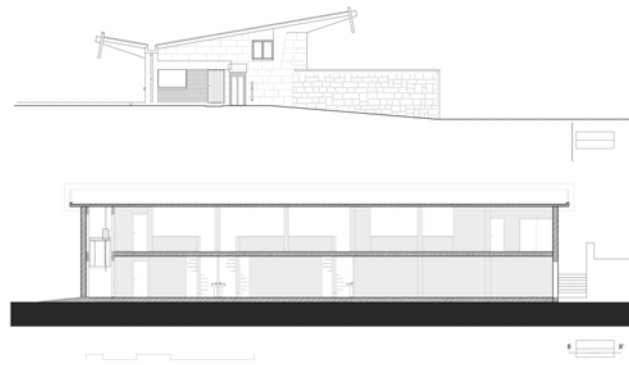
Plan and longitudinal section of main pavilion of the Market with proposed lift insertion at the top.
